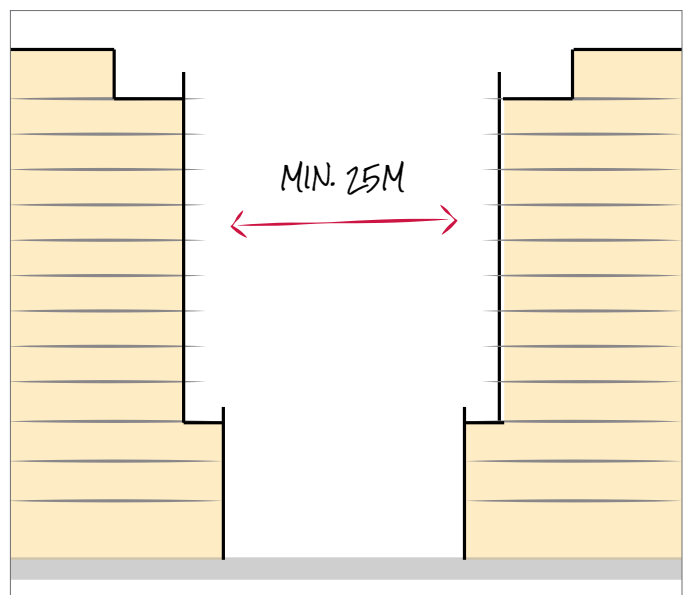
Provide separation distance between towers on the same site of 25m or greater (5.1.3 c).
